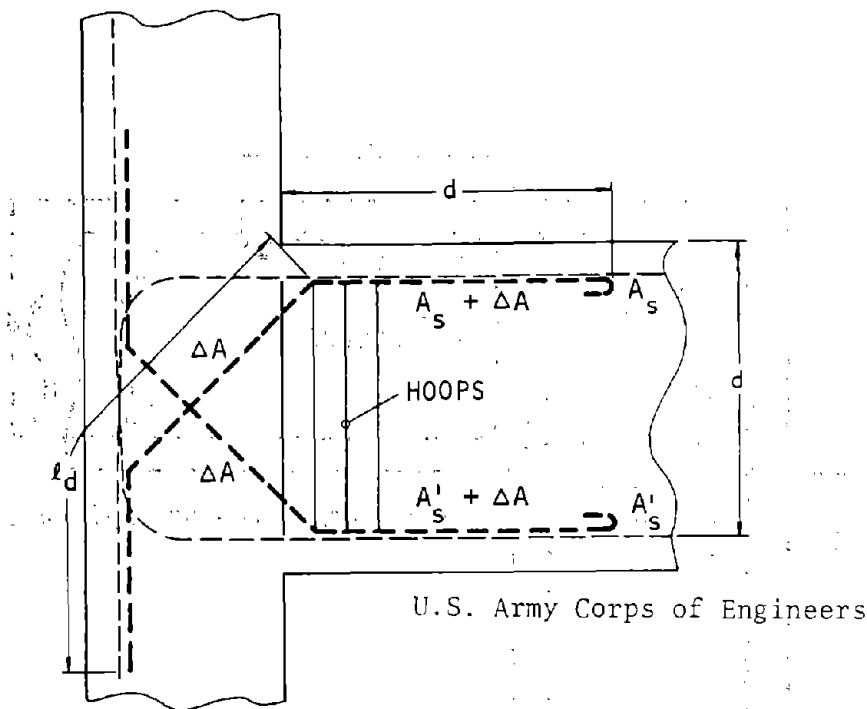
Exterior Connection with Additional Diagonal Steel and Hoops for Additional Web Shear
